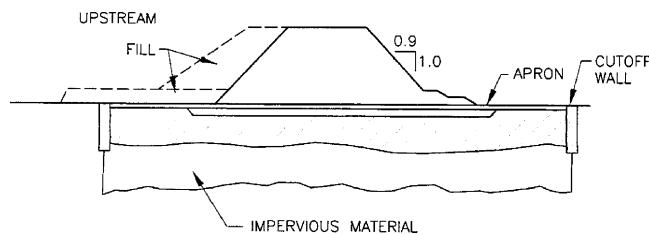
Typical low RCC dam section for nonrock foundation.
